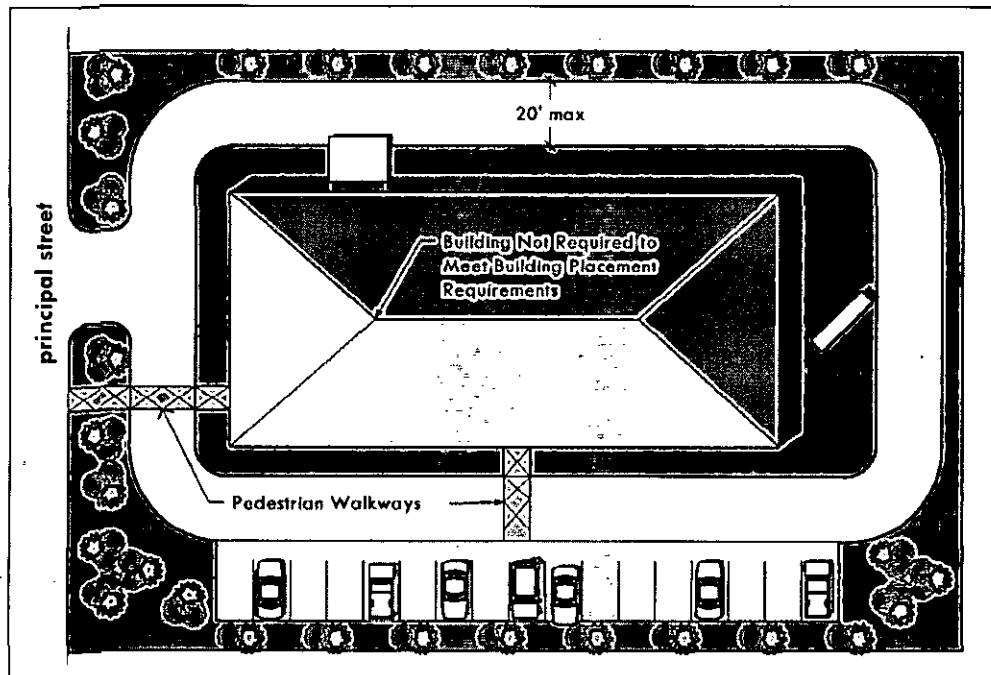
Drive-through uses serviced by a single curb cut do not have to meet the building placement standards in order to allow for a circulation lane.
